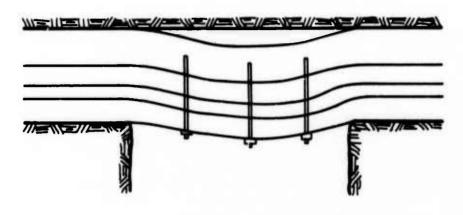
TYPICAL ROCK BOLTING FOR A STRATIFIED ROOF
